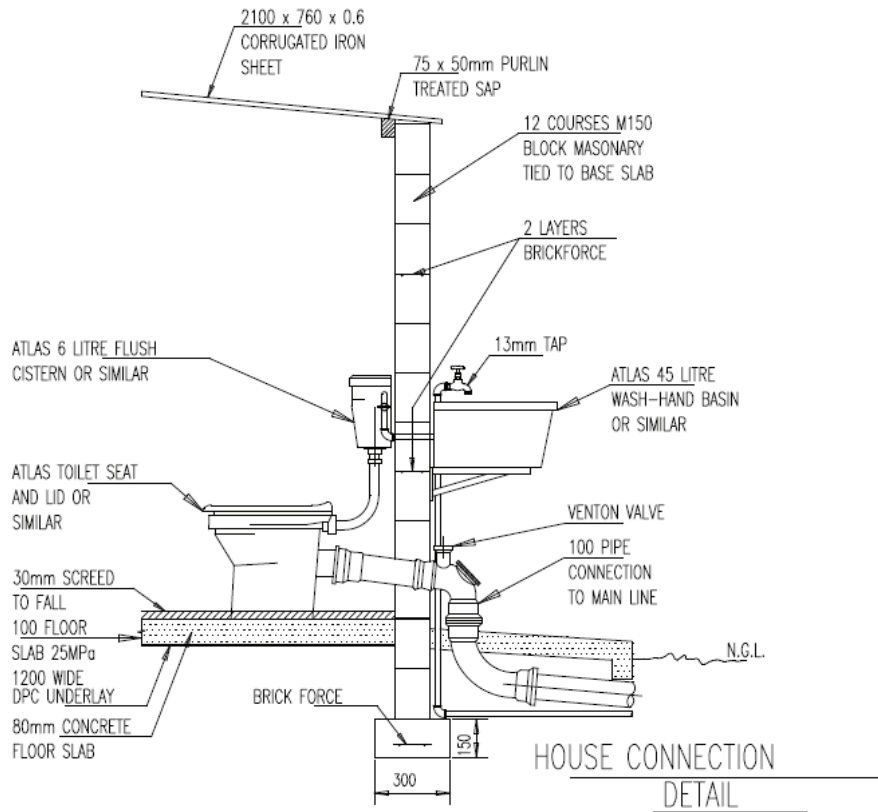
Schematic diagram of household connection design detail for full waterborne sewage at Ntuthukoville, Pietermaritzburg
